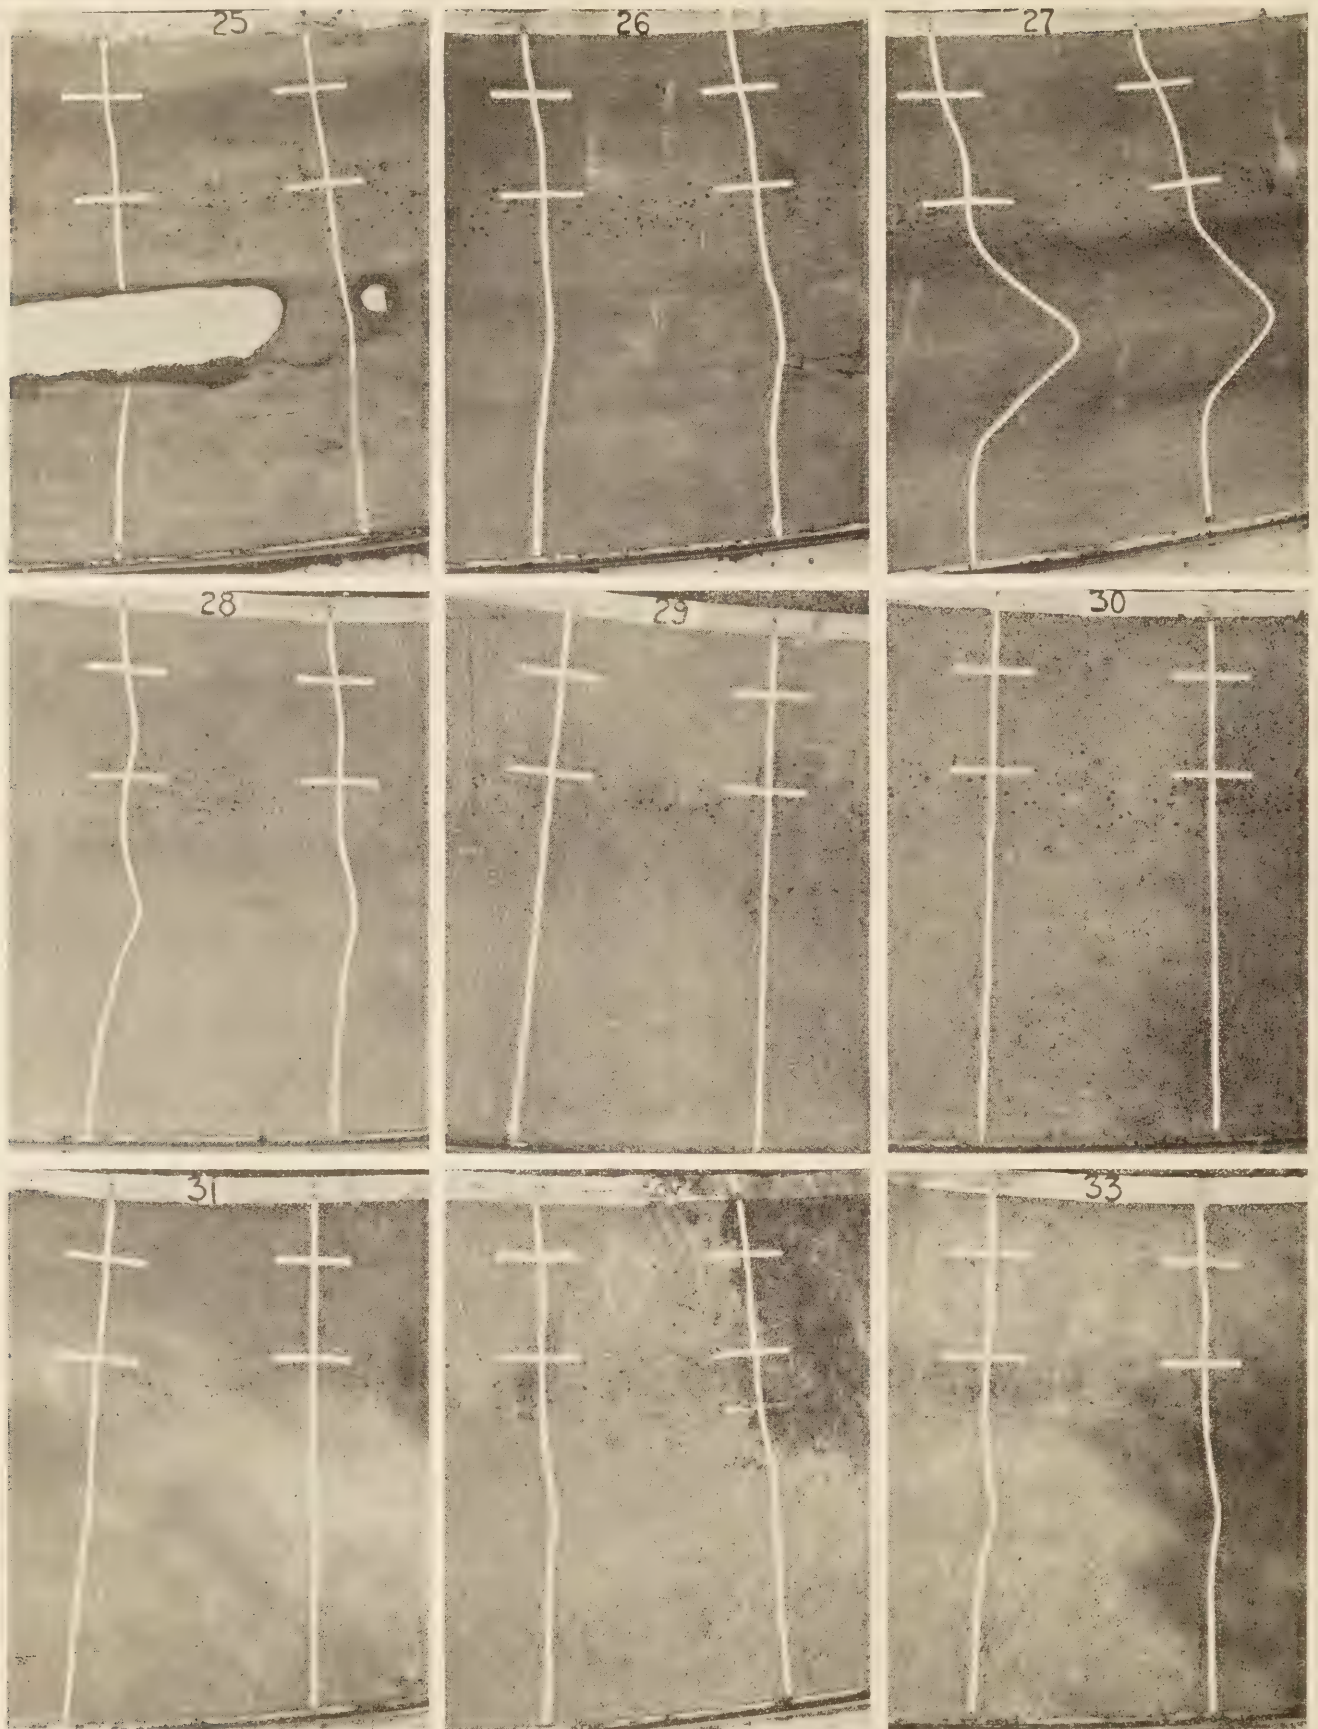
CONDITION OF TEST SECTIONS OF SECOND SERIES ON COMPLETION OF TESTS.
